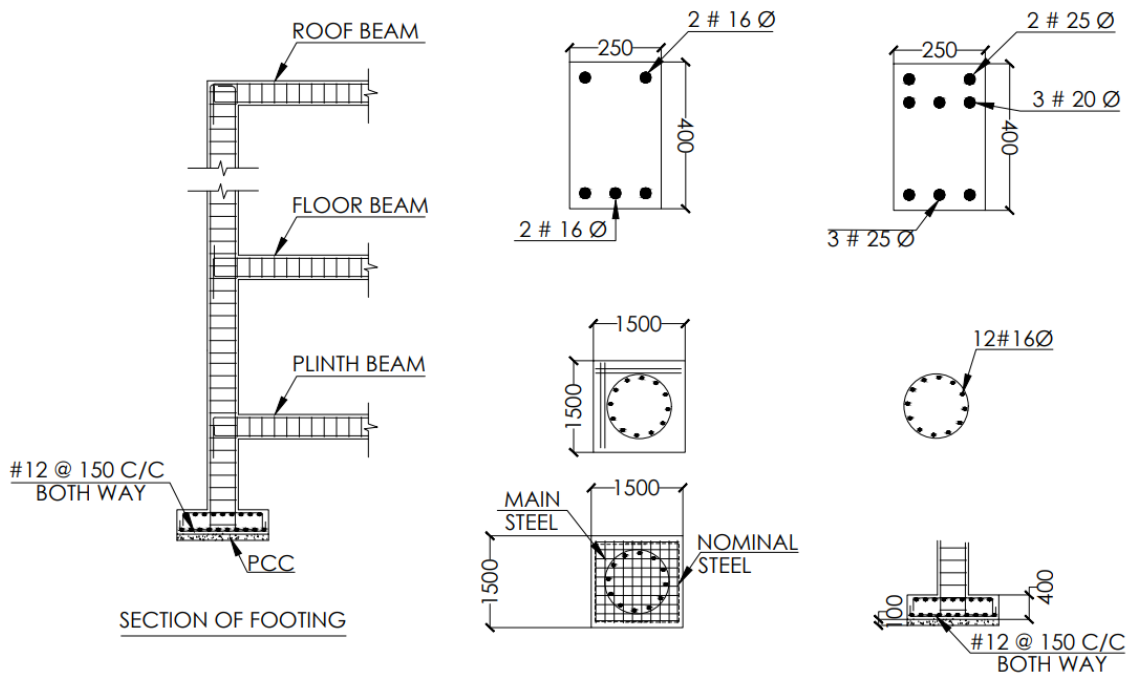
(d): The section plan of the footing in the raft foundation in resettlement units
